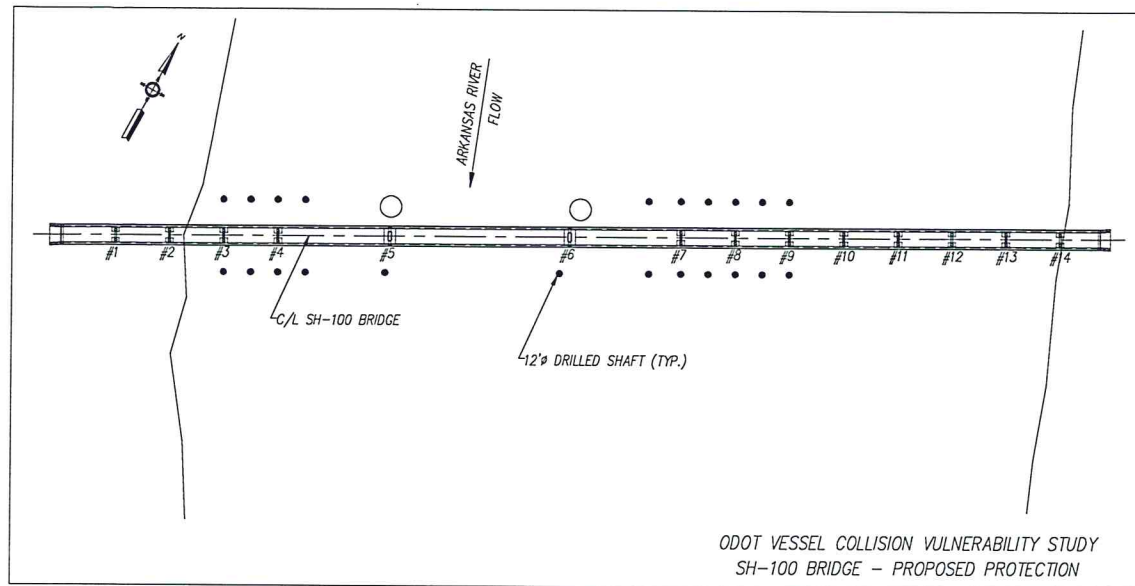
Bridge Plan View with Proposed Pier Protection
